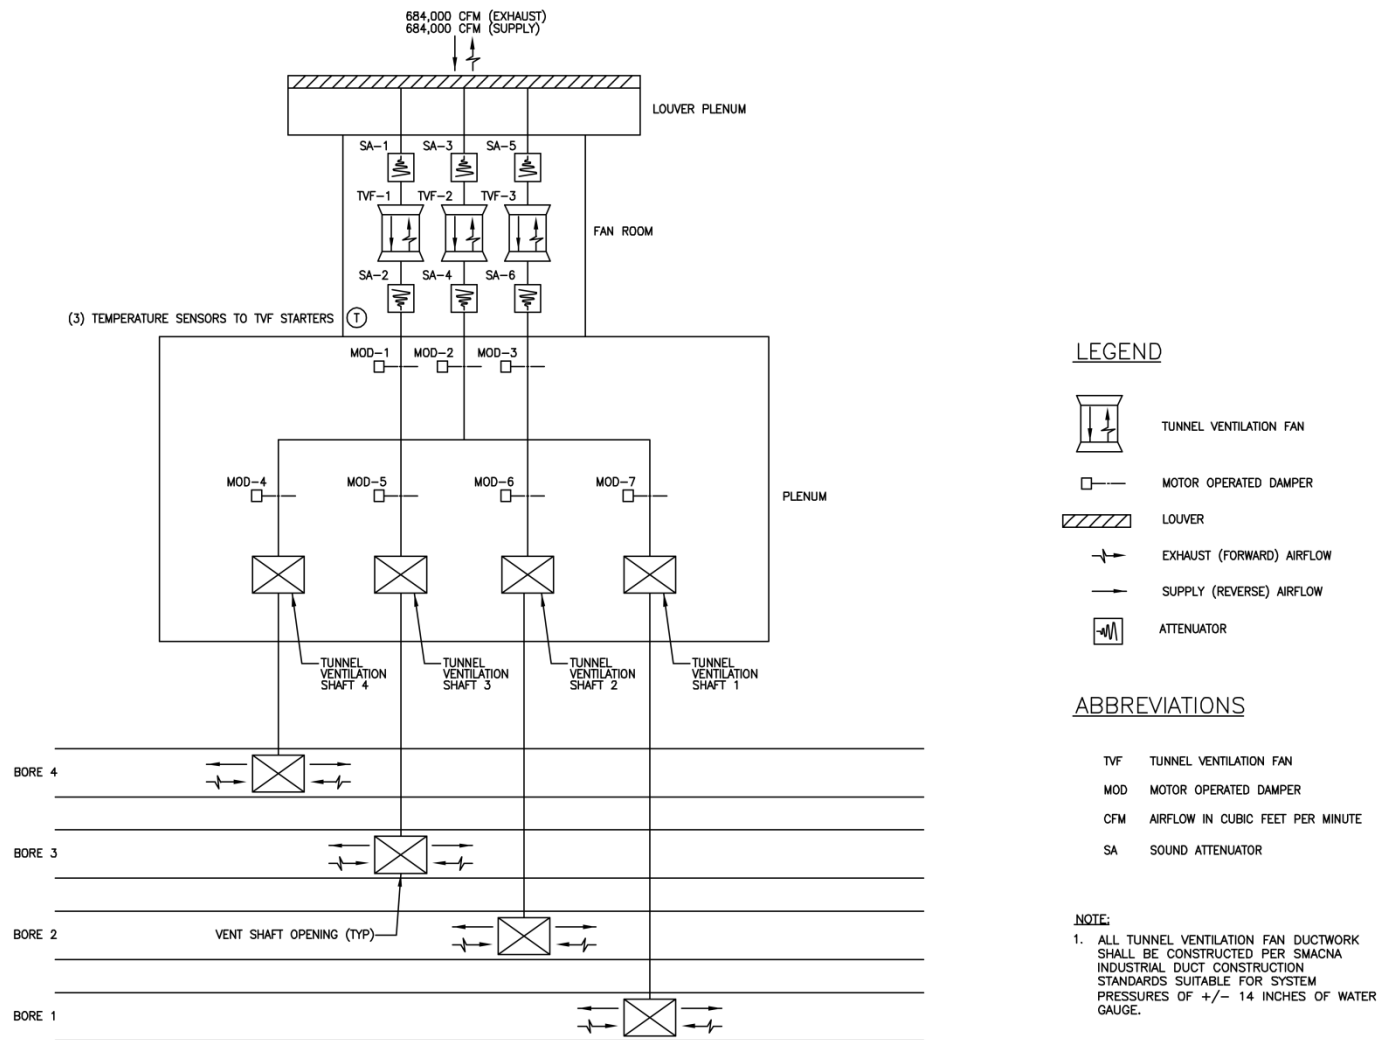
Sample tunnel ventilation air flow diagram.
